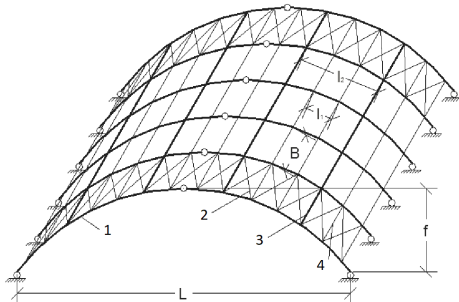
Structural solution of considered arch-type timber roof: 1 – three-hinged arch; 2 – transversal bracing truss; 3 – vertical bracings; 4 – purlins; B – bay of arches; l_1 – distance between the purlins; l_2 – distance between the vertical bracings; f – camber of arches; L – span of arches [8].
